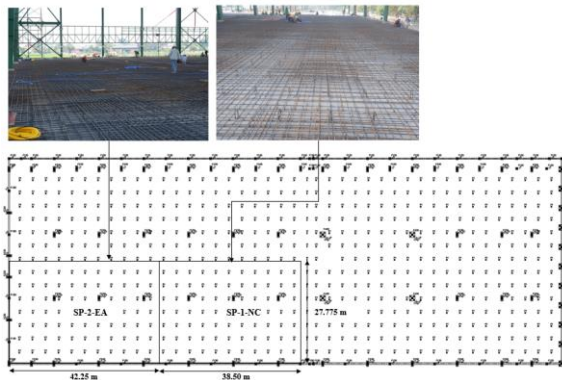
Plan view and site condition of the investigated slabs on pile
